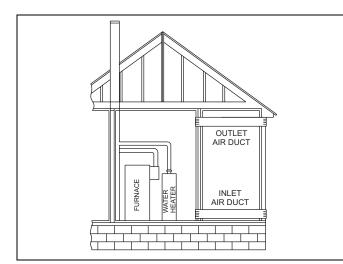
Horizontal Air Inlet, Outlet and Chimney Connections
